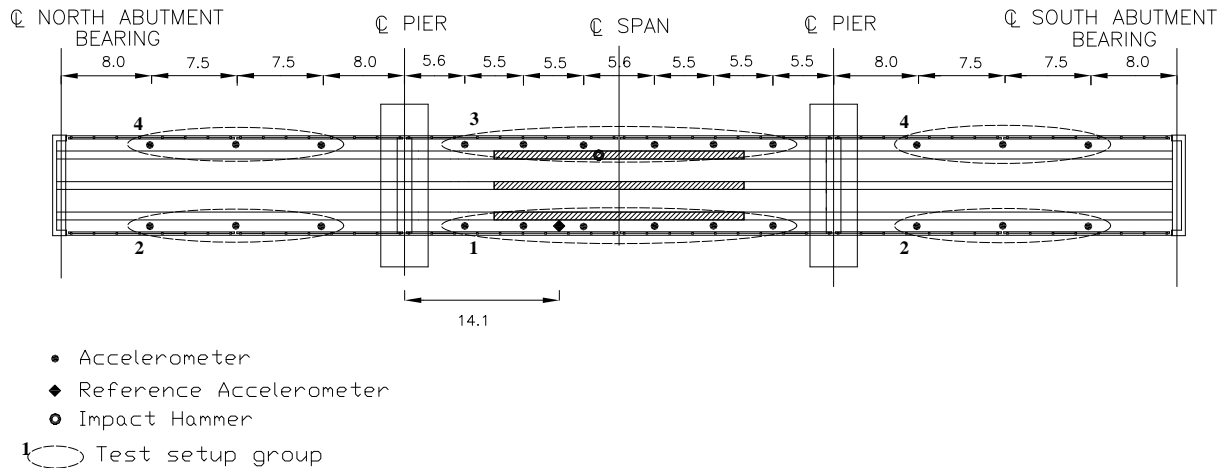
A plan view showing instrumentation locations for impact testing at the Hudson Bay Bridge.
